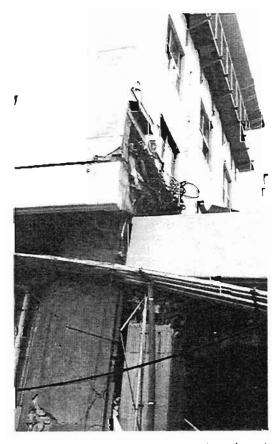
First floor column damage due to impact across expansion joint
